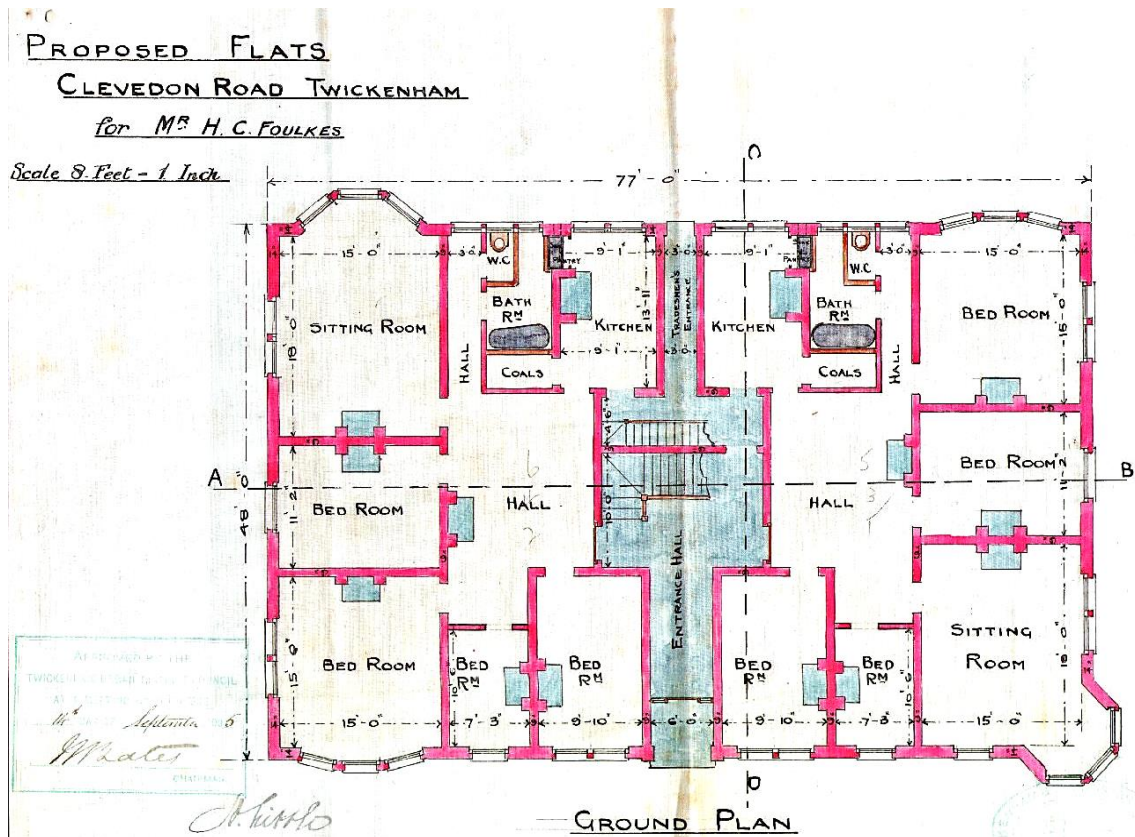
Building plan submitted by Foulkes for flats in Clevedon Road.¹⁶⁸
